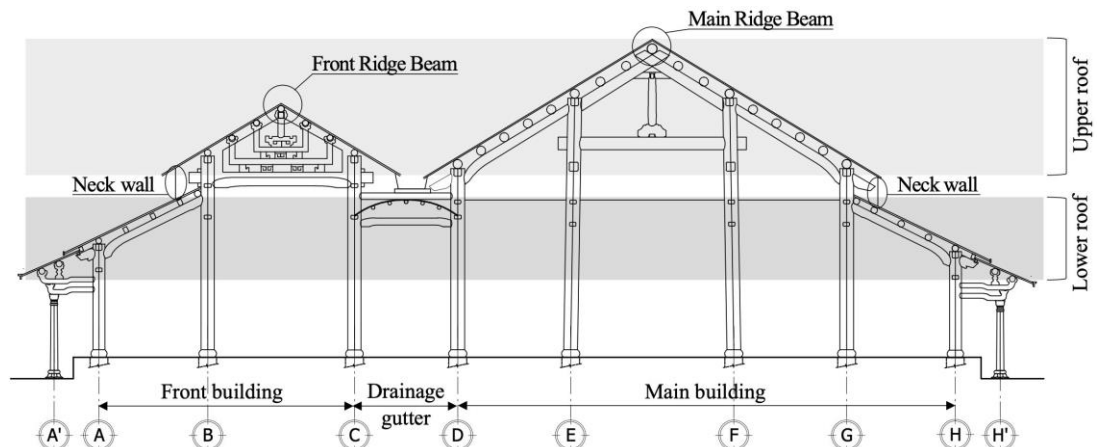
A typical section has double ridge beams (the front ridge beam and the main ridge beam) and two layers of roof (the lower roof and the upper roof)
